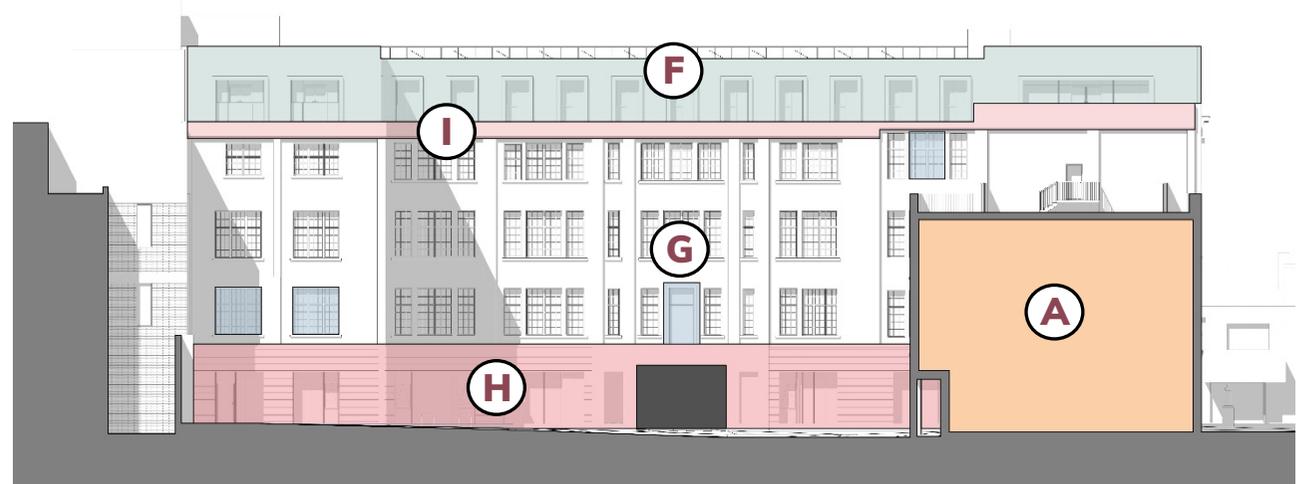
Proposed Alterations & Additions, Courtyard Façade, Sorting Office
